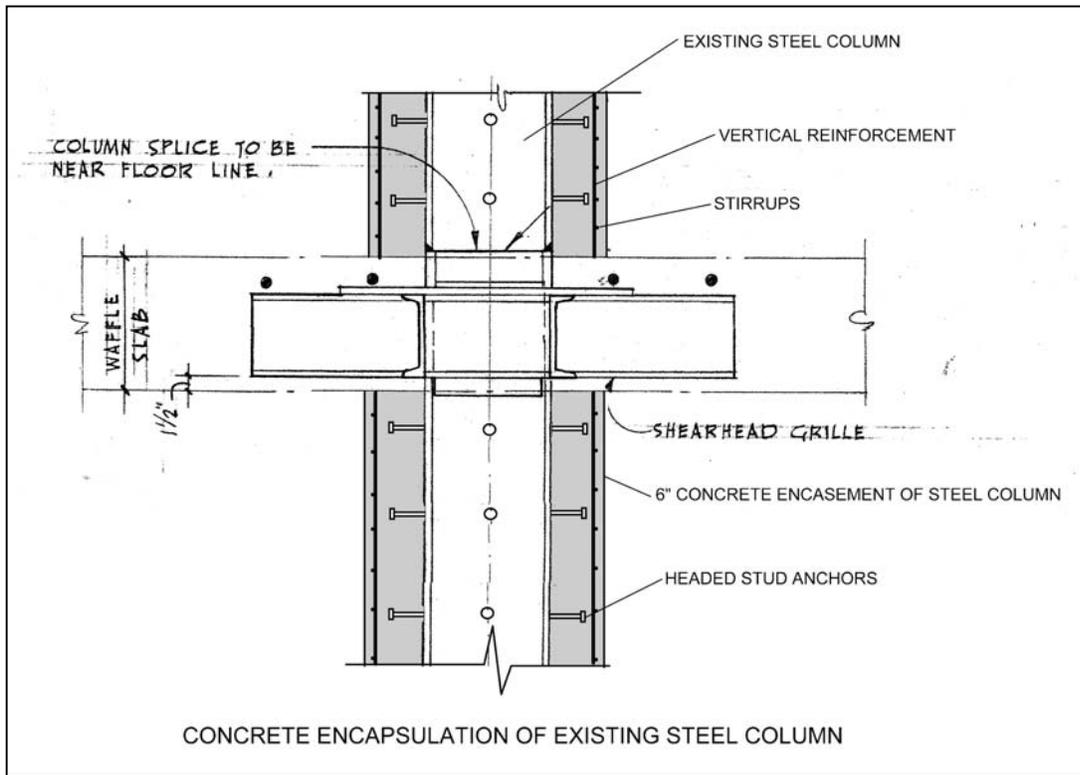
Reinforcement of Existing Columns and Floor to Column Connection.
